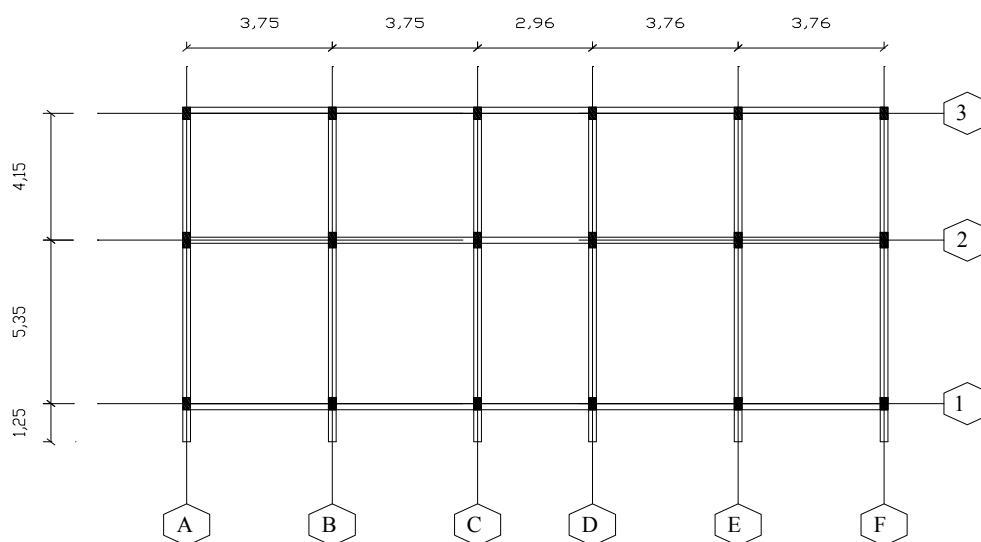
Plane view of typical building of "Cit  des 1200 logements"
